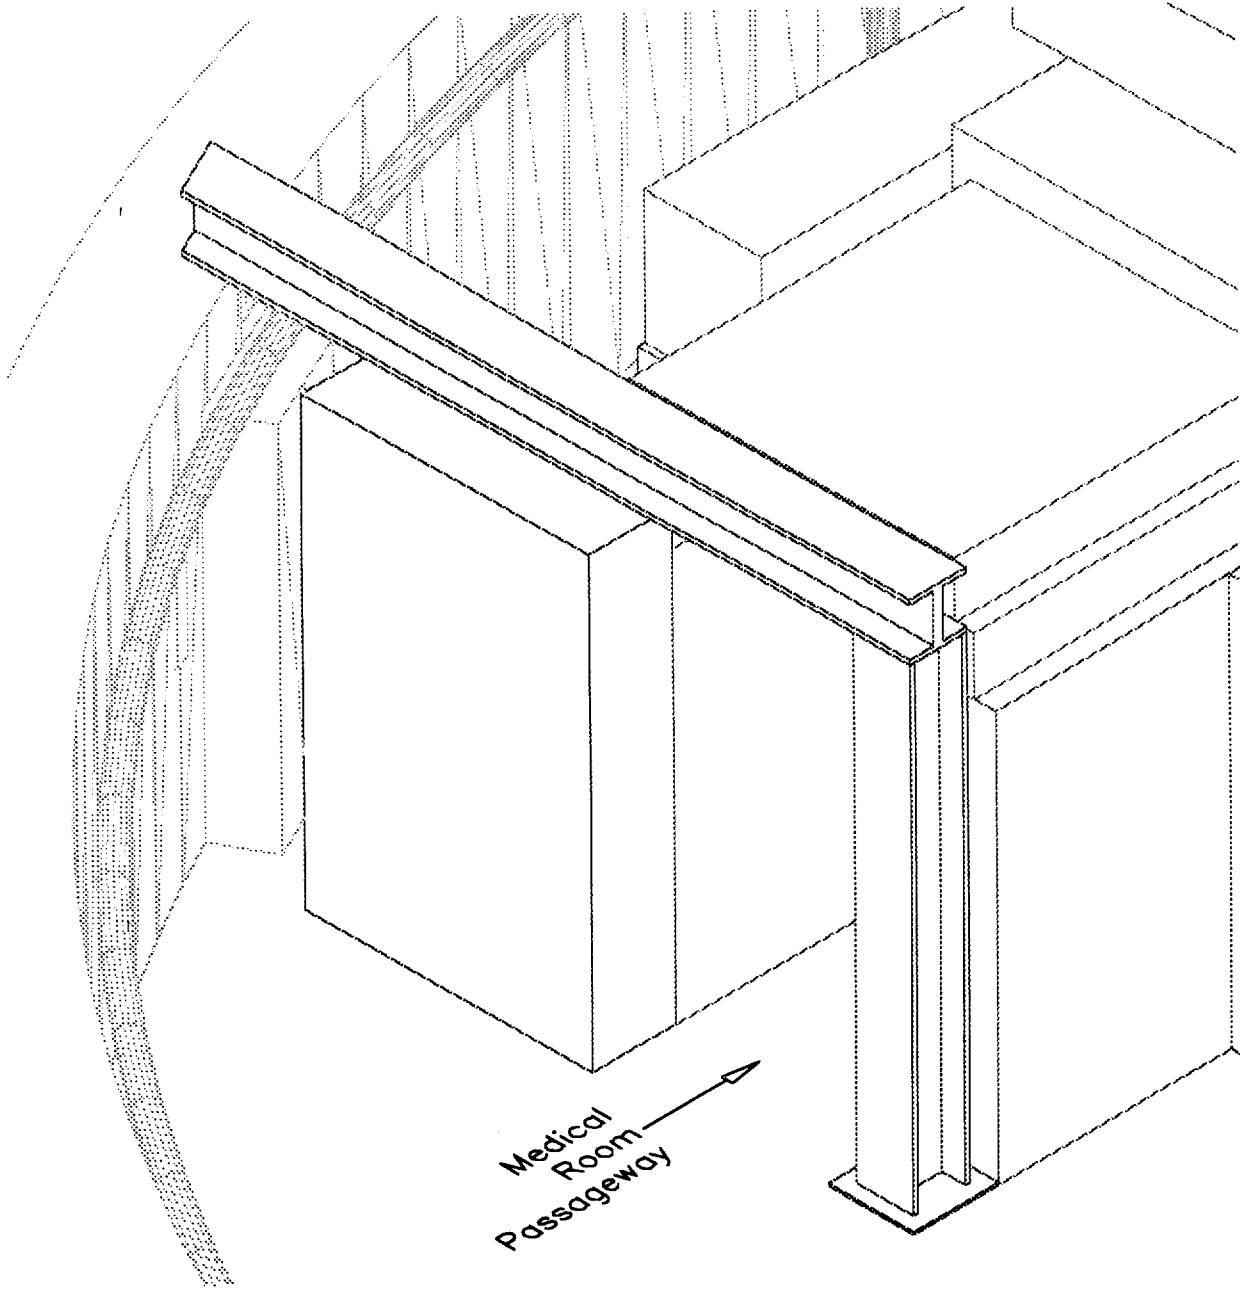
Parallel-to-Beam Sliding Door (door will be suspended from horizontal I-beam by trolleys -- not shown).
